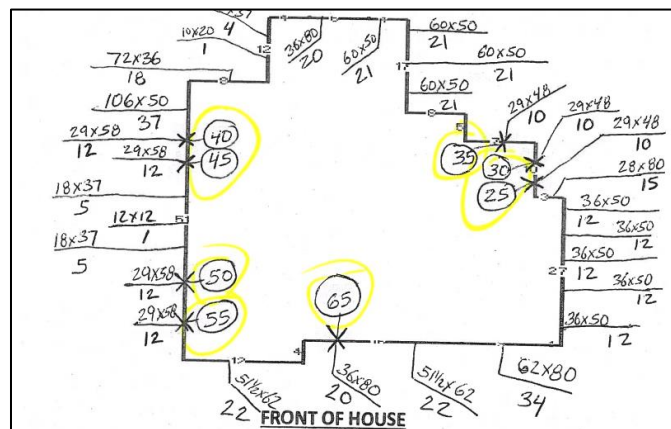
Site plan showing the front door (65) and seven windows to be replaced.
